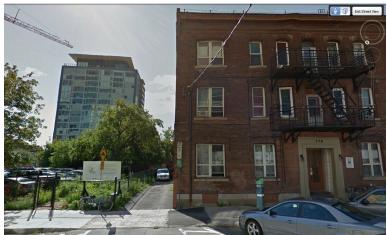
Street view of the west edge of the development site on Nepean. The driveway to the left of the building is a 3m easement to provide access to the back of buildings fronting on Bank Street. Soho condominium tower on Lisgar Street is in the background. Source: Google Earth.
